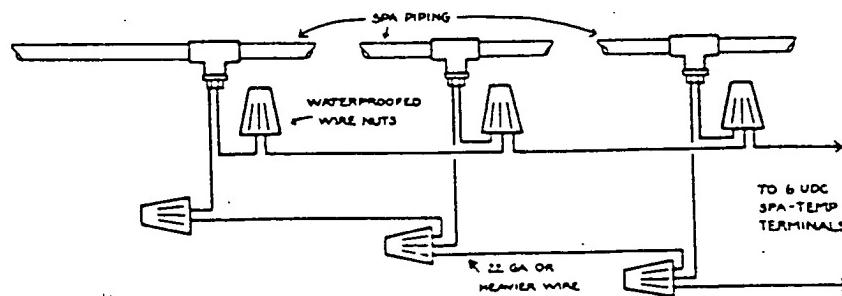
MULTIPLE SENSOR INSTALLATION
